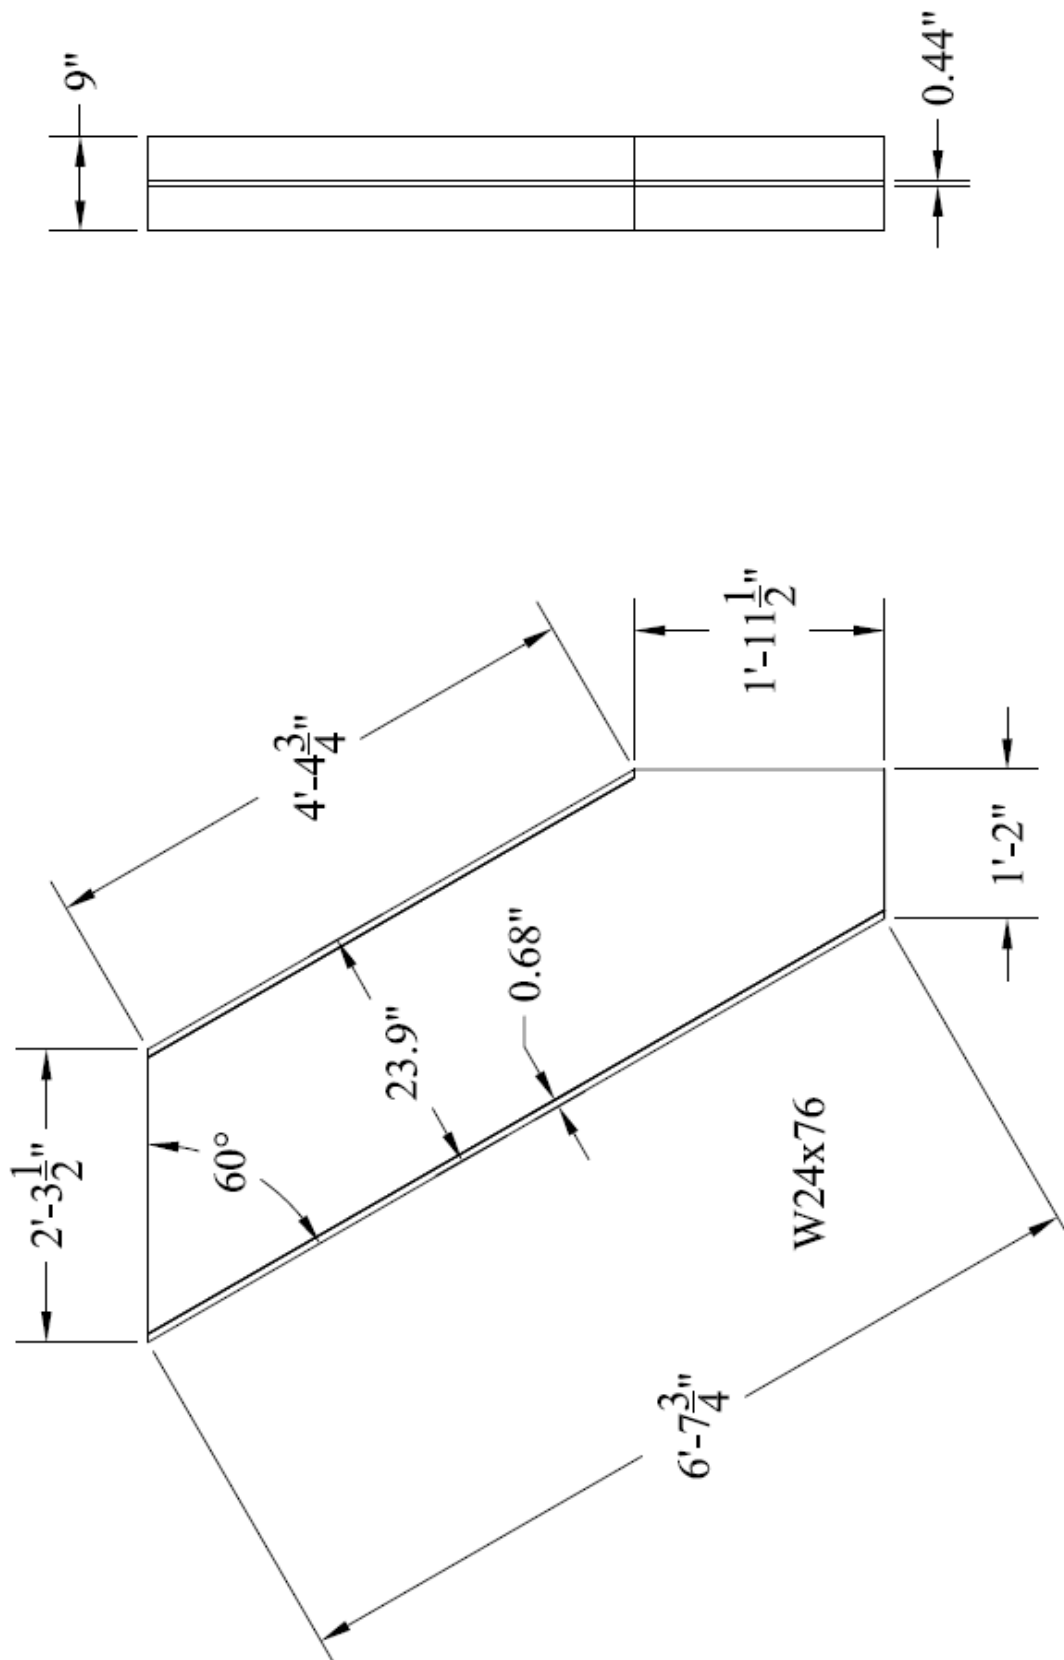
Loading Frame c1001 (1 in. = 25.4 mm)
